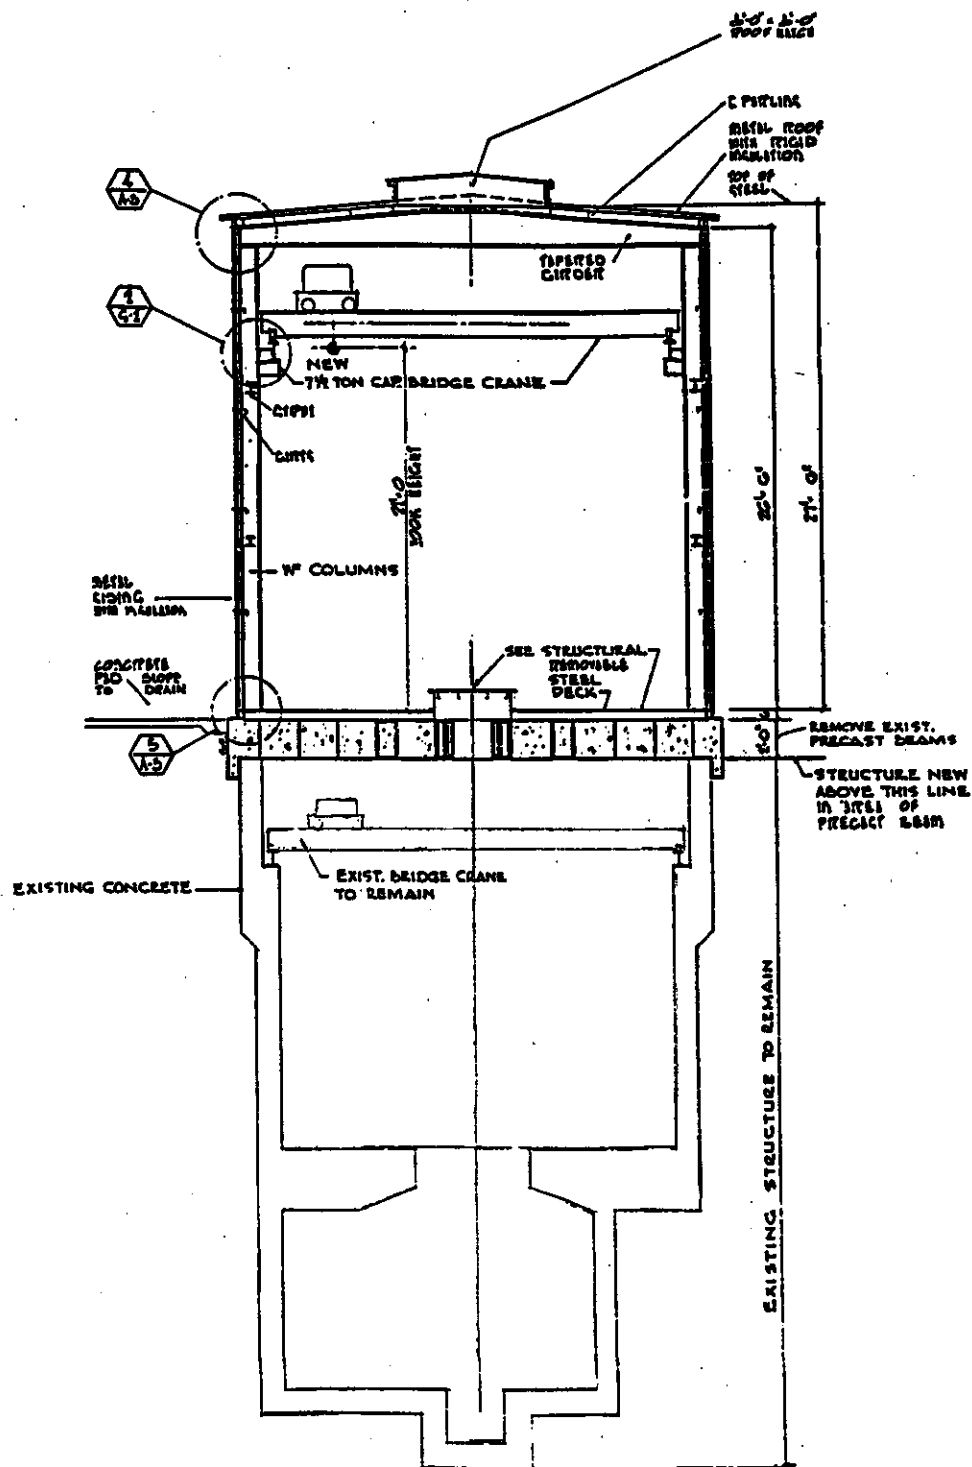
Section of the High Bay, Building 5400A, Super Kukla facility, ca. 1968.
